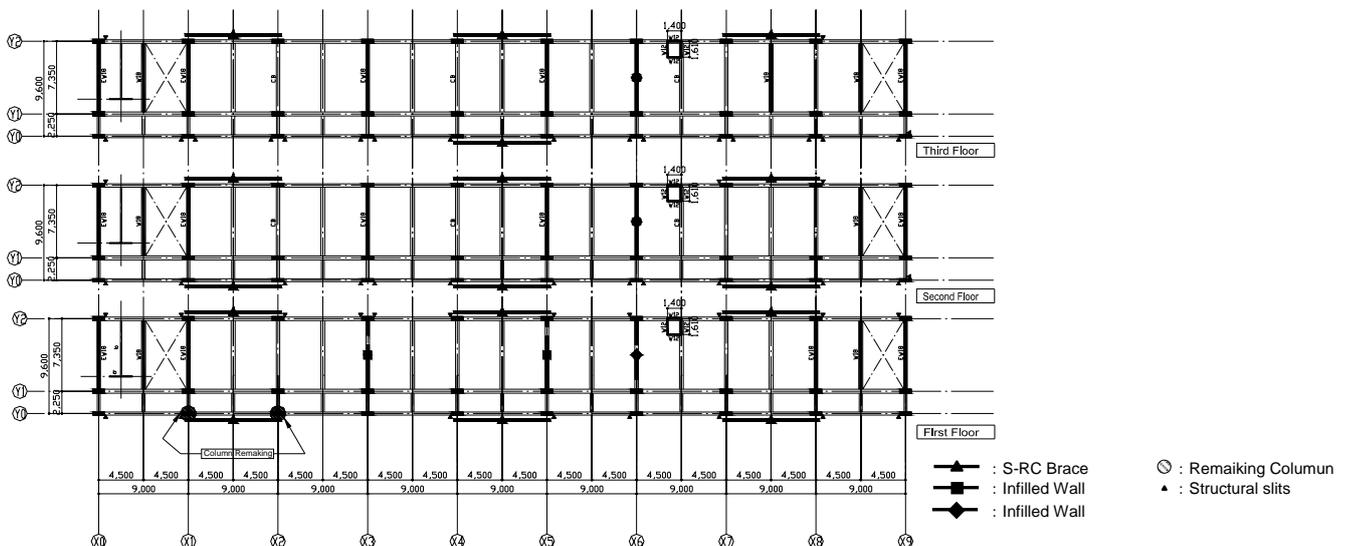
Arrangement of Retrofitting Members in Plans of Each Floor
